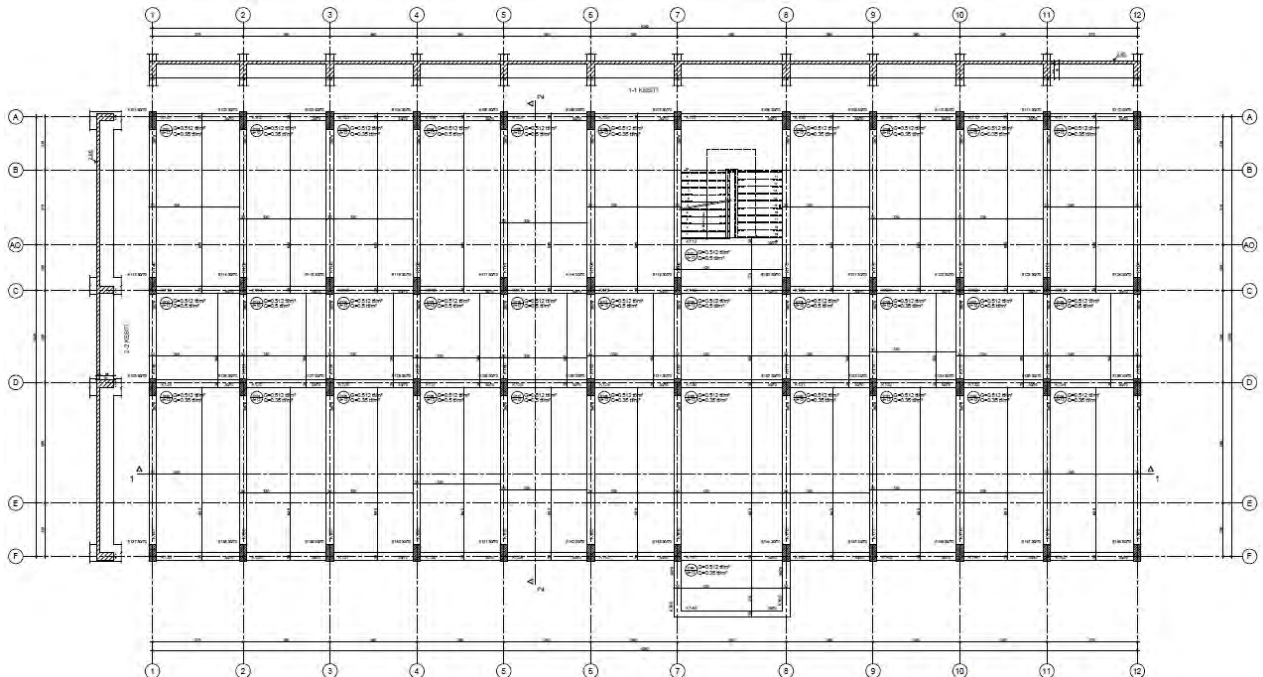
Existing 3 Storey Building Without Shear Walls
